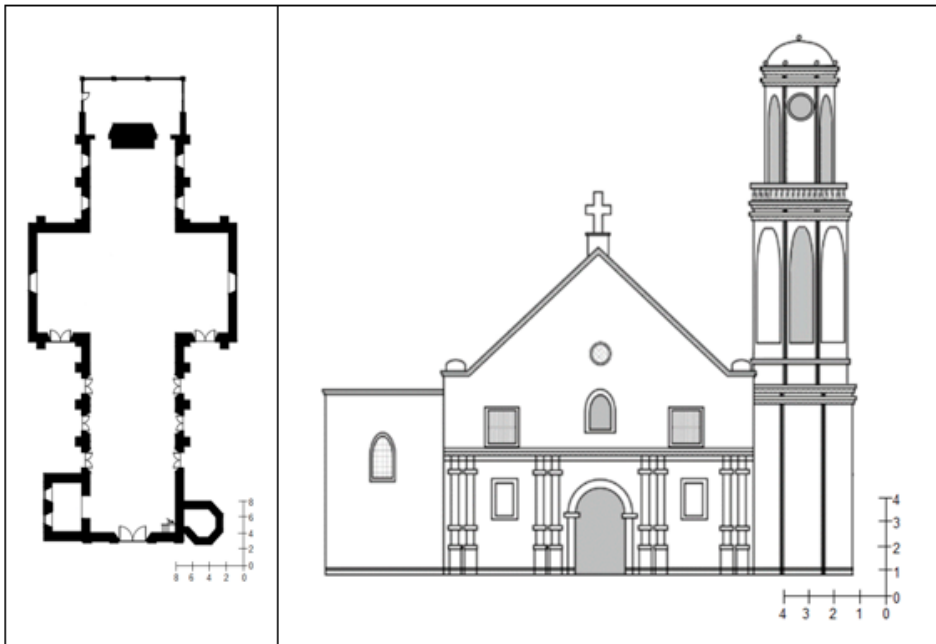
Floor plan and façade of the OLAC. Source: Liwanag, Demeterio, and Fernandez, Jr. 2020.
